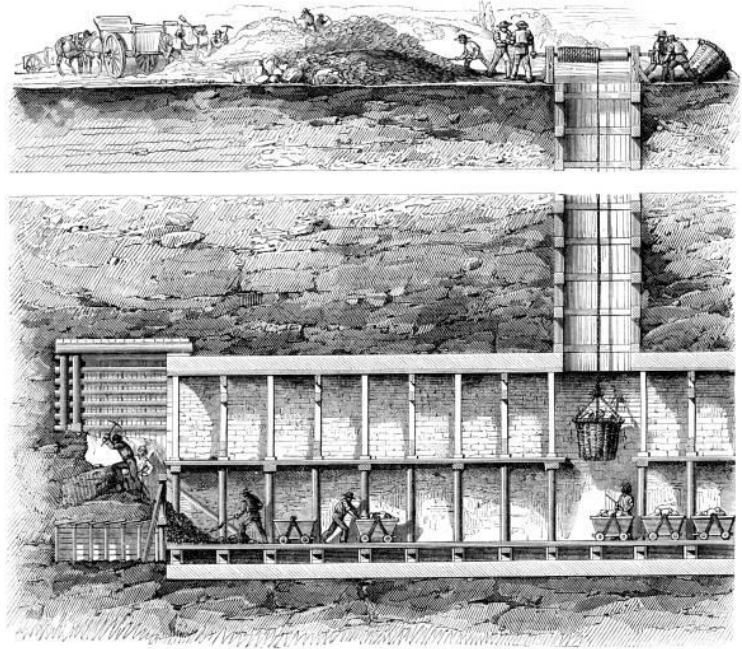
Underground Coal Mine Conceptual Sketch.
